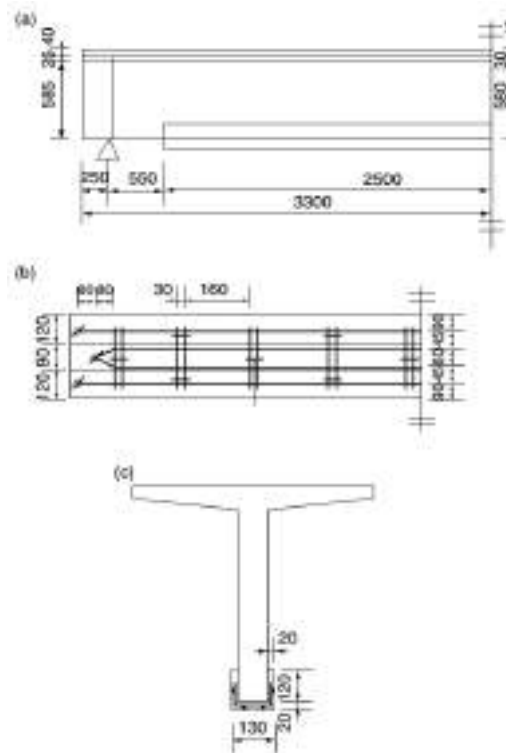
Details of strengthened beams. (Source: Xing et al., 2010).
